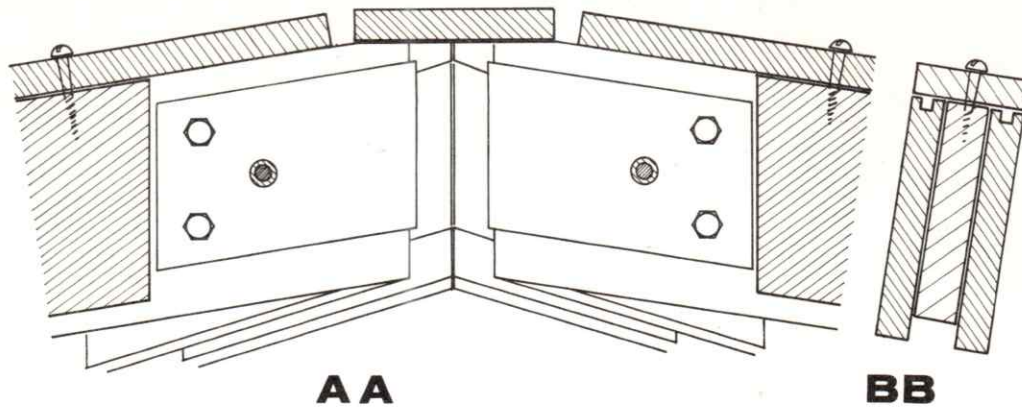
Joint details adjacent struts are joined by a metal angle secured by spacer and screw assemblies. Enclosure was fiberglass panels locked to the strut by flanges fastened in a continuous groove, see Section BB. Dome was not built. Study by Geometrics, Incorporated.
